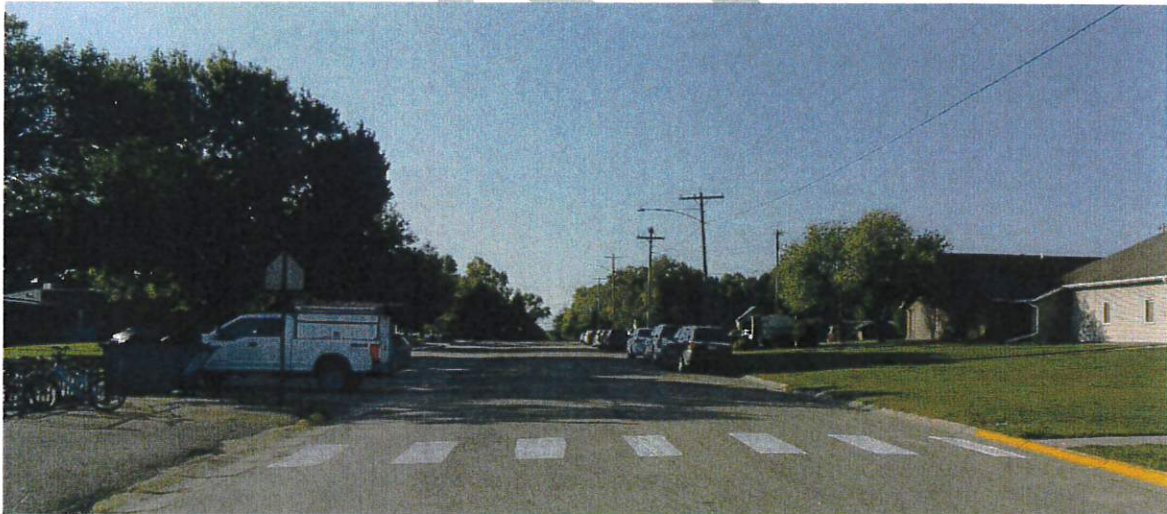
17th Street, South of Intersection with I Street (Looking South)
